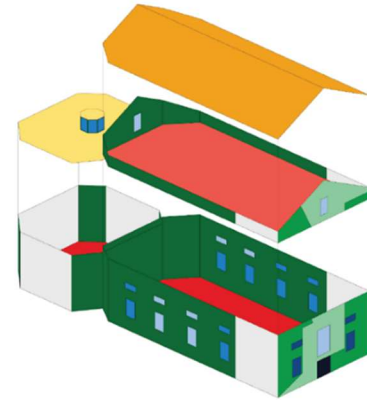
Thermal model built in Ladybugtools showing the three thermal zones. Walls in grey were set as adiabatic, as they are facing adjacent spaces.
